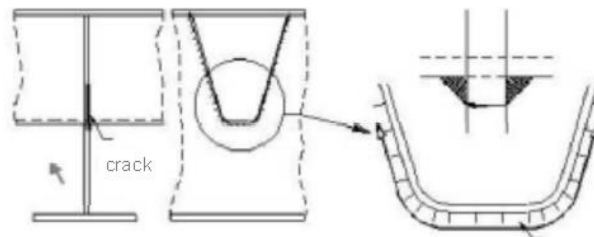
Type 2: Connection trough element to cross beam (Dooren, F. van)
